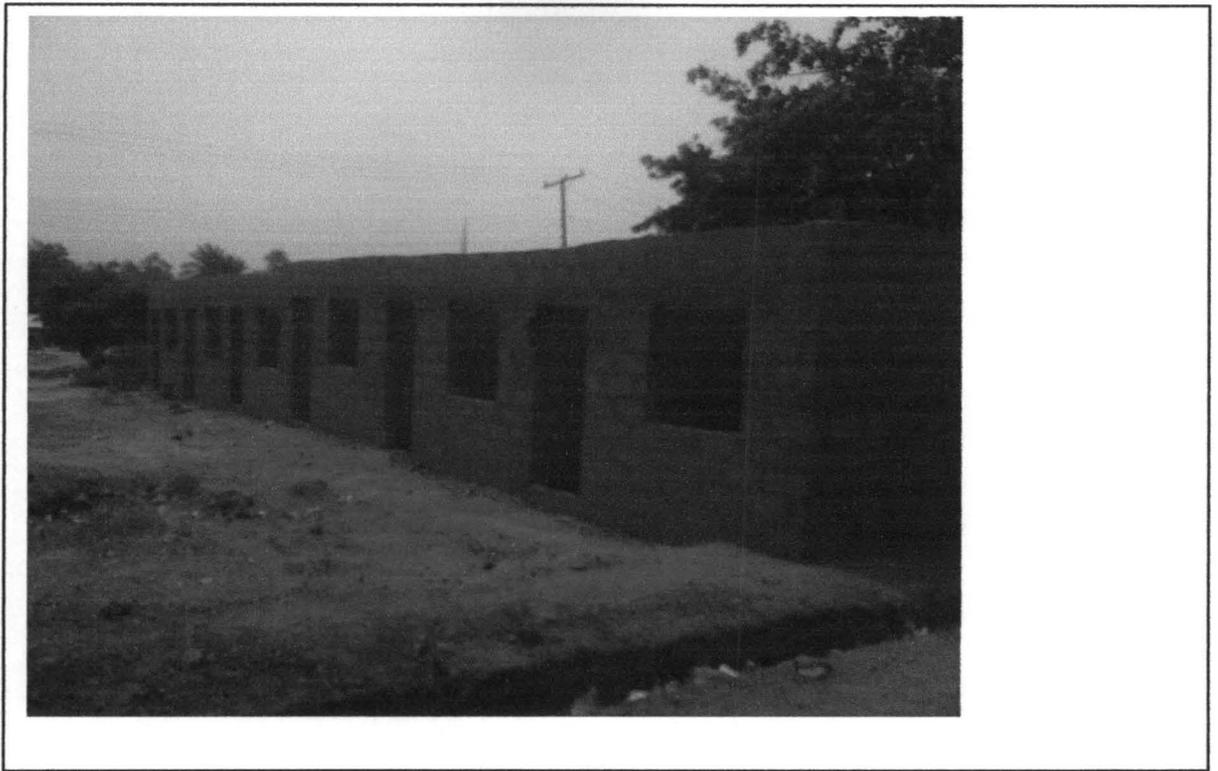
Plate VI: Vegetation area being converted to plots for building purposes at Angwan Nassarawa in Suleja
